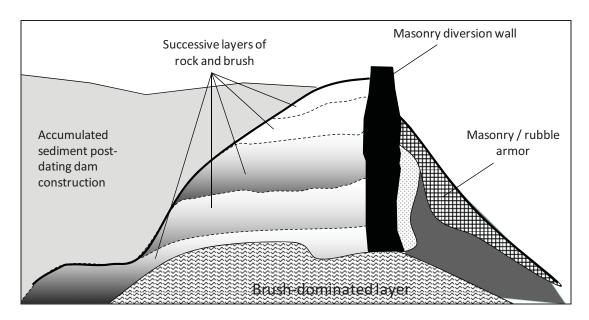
Generalized cross-section of diversion dam (facing north), showing primary stratigraphy, as well as the masonry diversion wall and rubble armoring on the diversion's eastern face.
